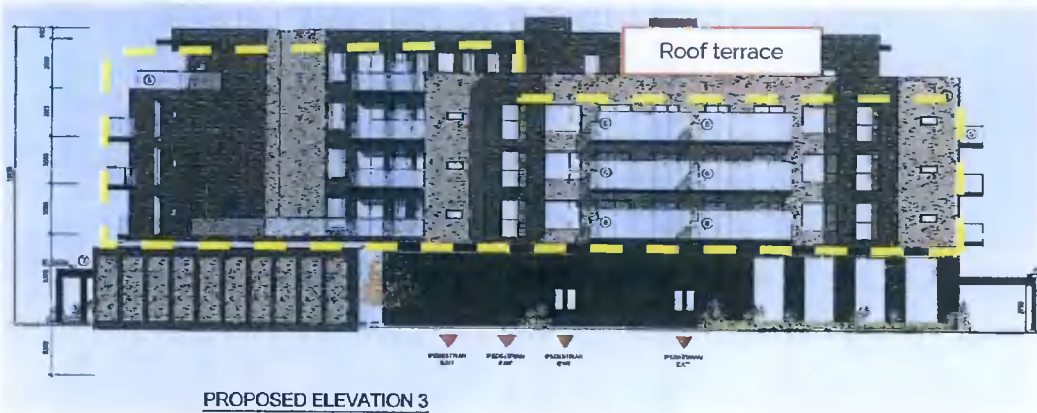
Scheme's Elevation 3 with overlooking windows, balconies & roof terrace from storeys 2 to 5
